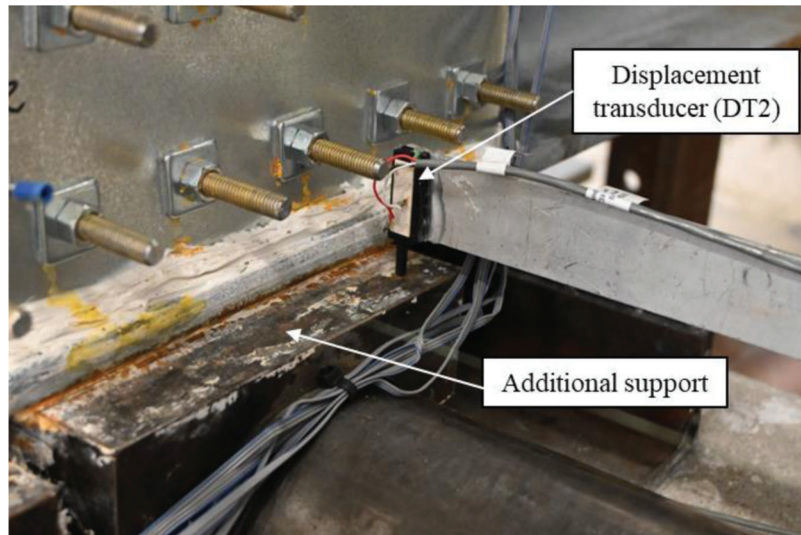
Example of DT2 installation for Specimens 4 and 5.
